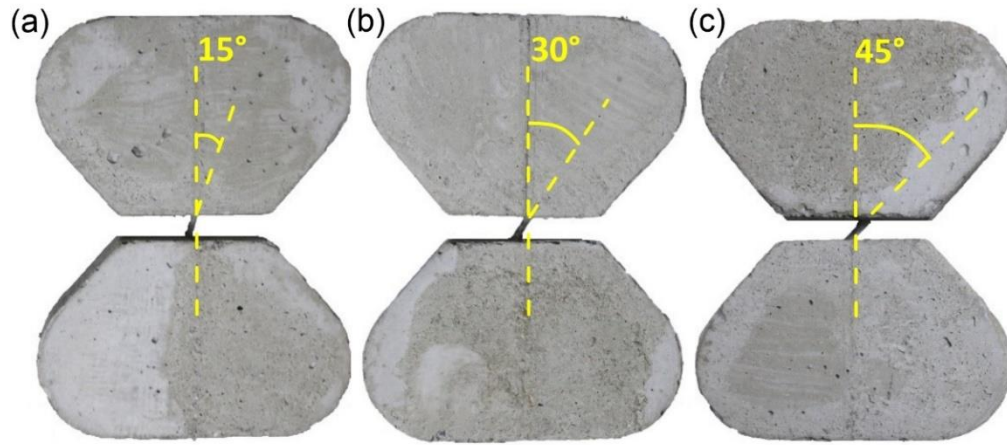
Specimen after demolding with fibers inclined to (a) 15°, (b) 30°, and (c) 45°.
